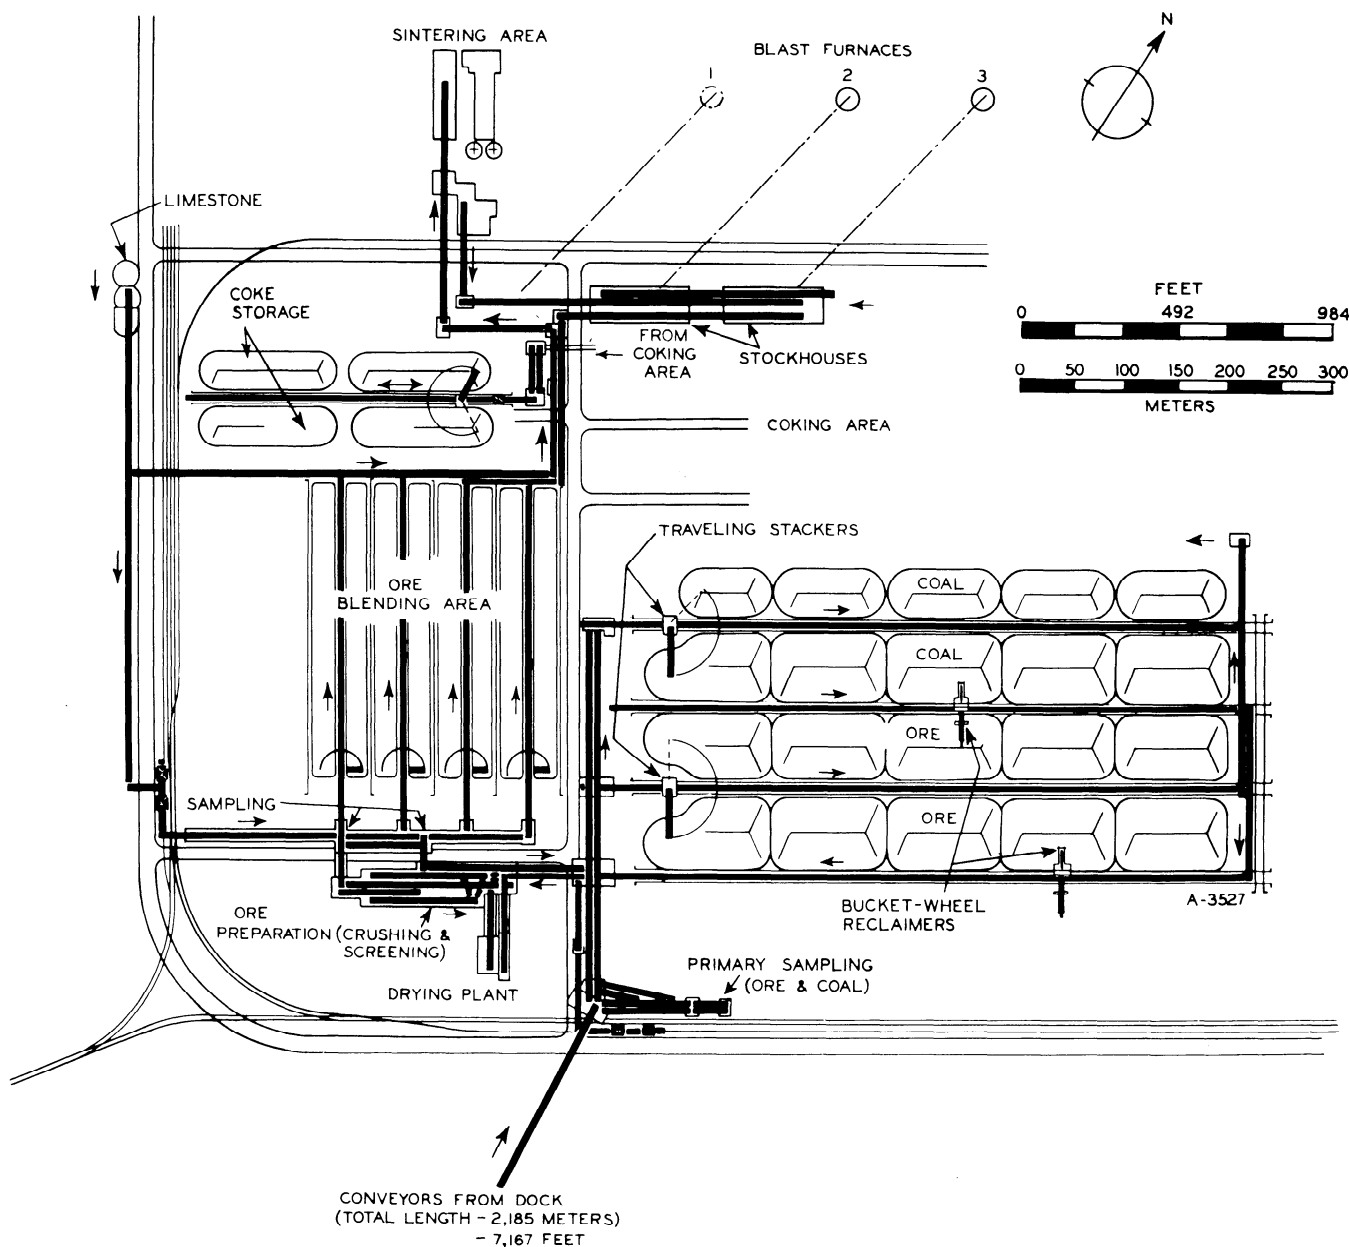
Typical open pile storage complex for handling iron ore and coal for a steel mill (courtesy: A.T. Yu).
